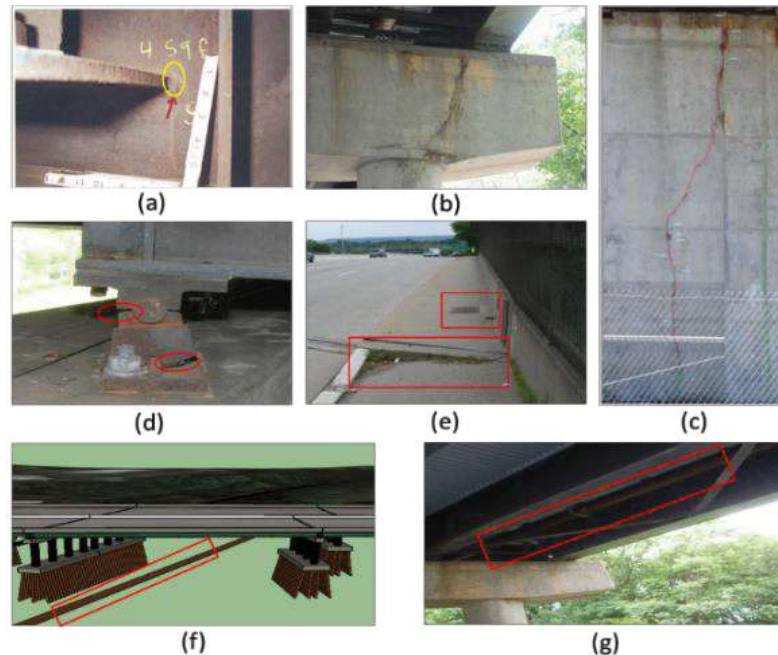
Examples of performance concerns: (a) fatigue cracking at girder web, (b) pier 1 cap cracking, (c) cracks on the abutment, (d) damaged bearing, (e) insufficient drainage damage, (f) water main crossing the bridge, (g) gas pipe.
